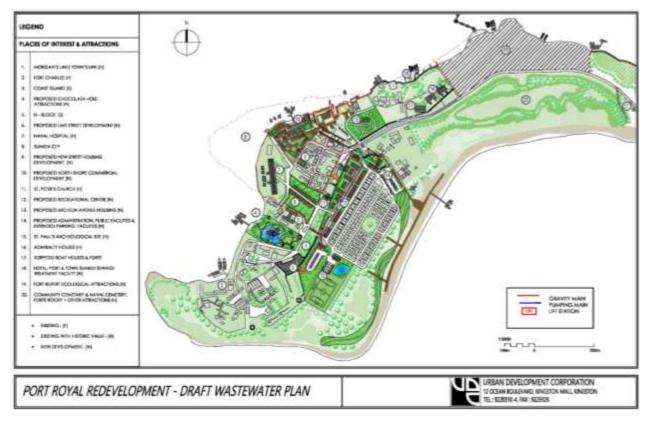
Proposed Sewerage Treatment and Disposal Plan for Port Royal
